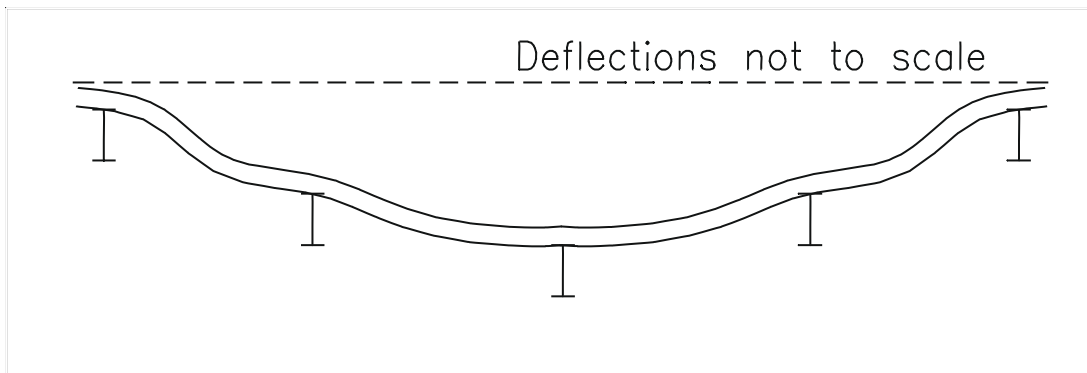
Cross-section of vibrating floor structure showing typical fundamental mode
